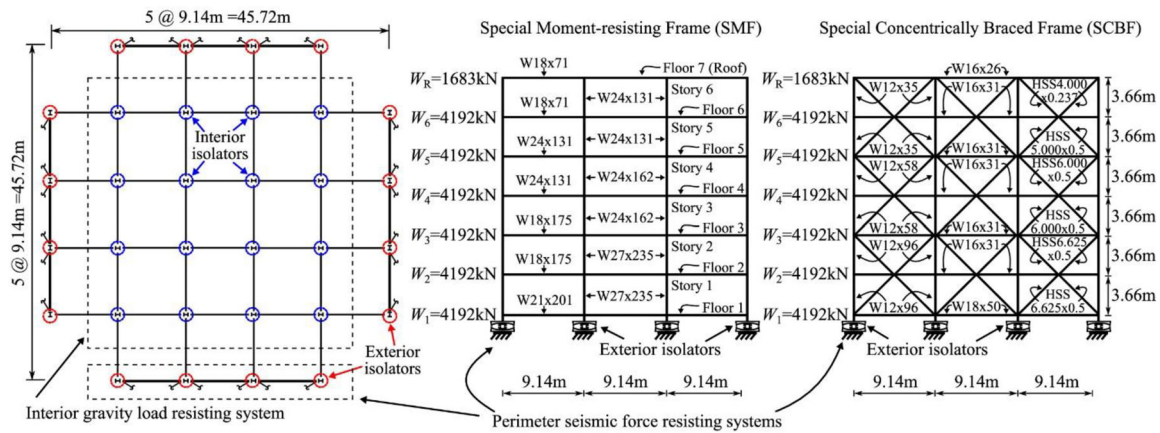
Plan and elevation of analyzed seismically isolated buildings
